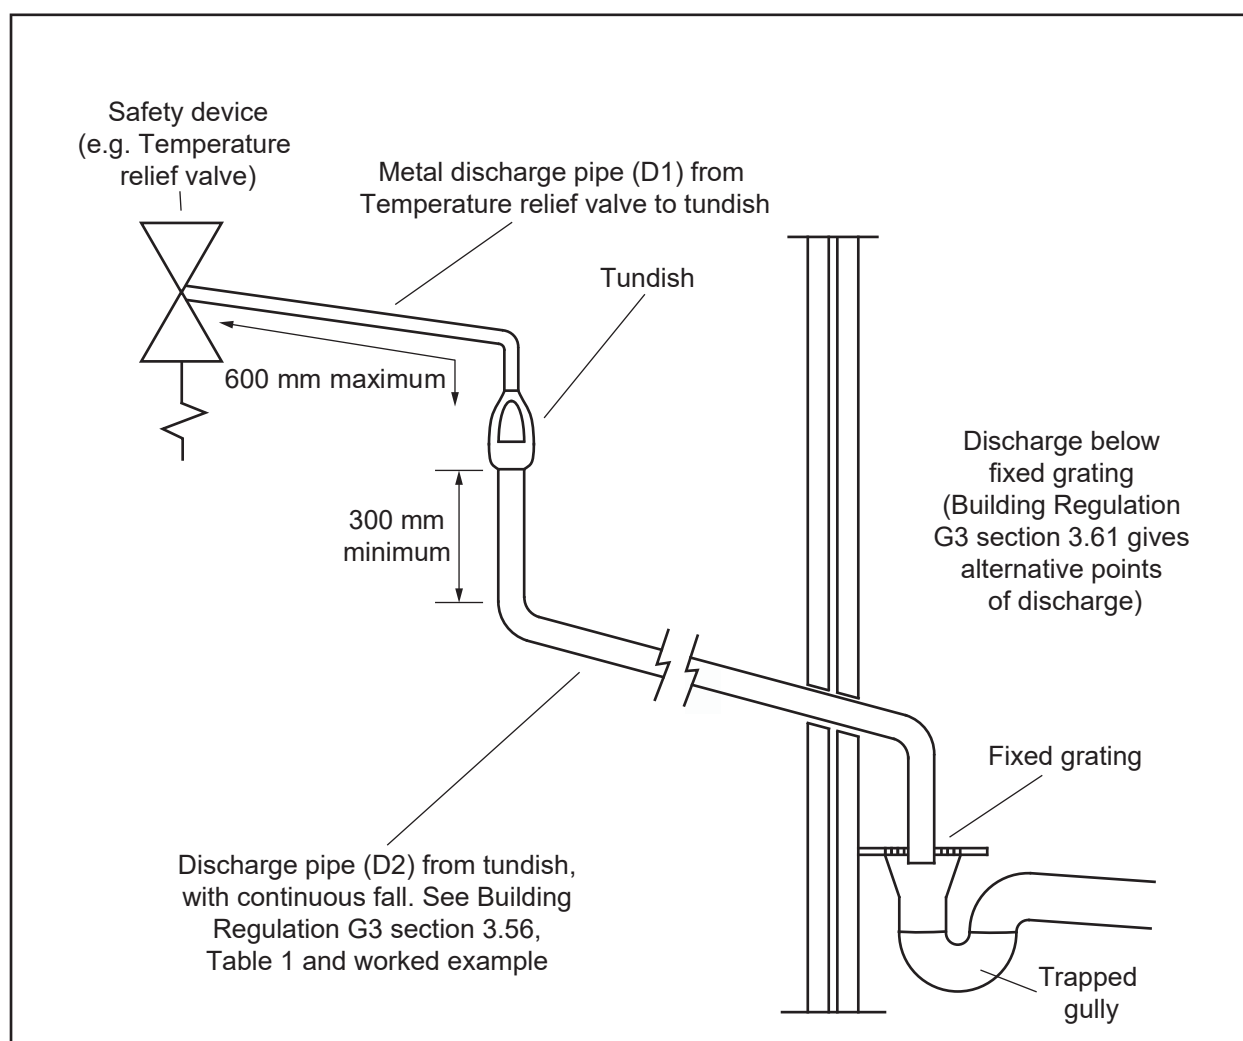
Typical discharge pipe arrangement (Extract from building regulation G3 guidance section 3.50)
